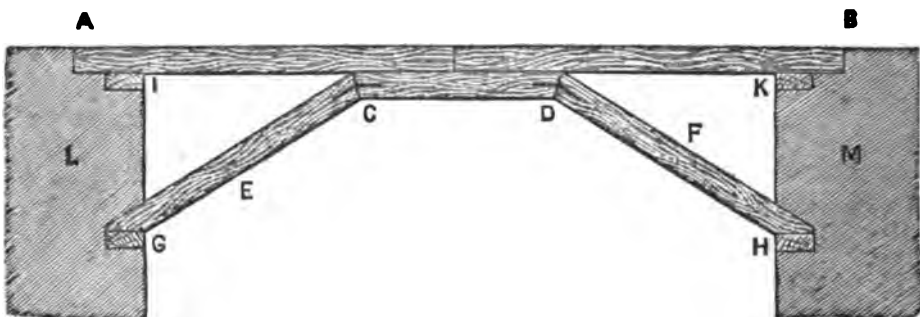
shows in elevation a longitudinal beam of a bridge of a greater span than 20 feet, when no long timber is available. A B the longitudinal beam which is in two parts; C D is the straining beam which strengthens the joint; E, F are struts supporting the longitudinal beams and abutting against the ends of the straining beam; G, H, I and K are wall plates; L and M represent the abutments of the bridge.
